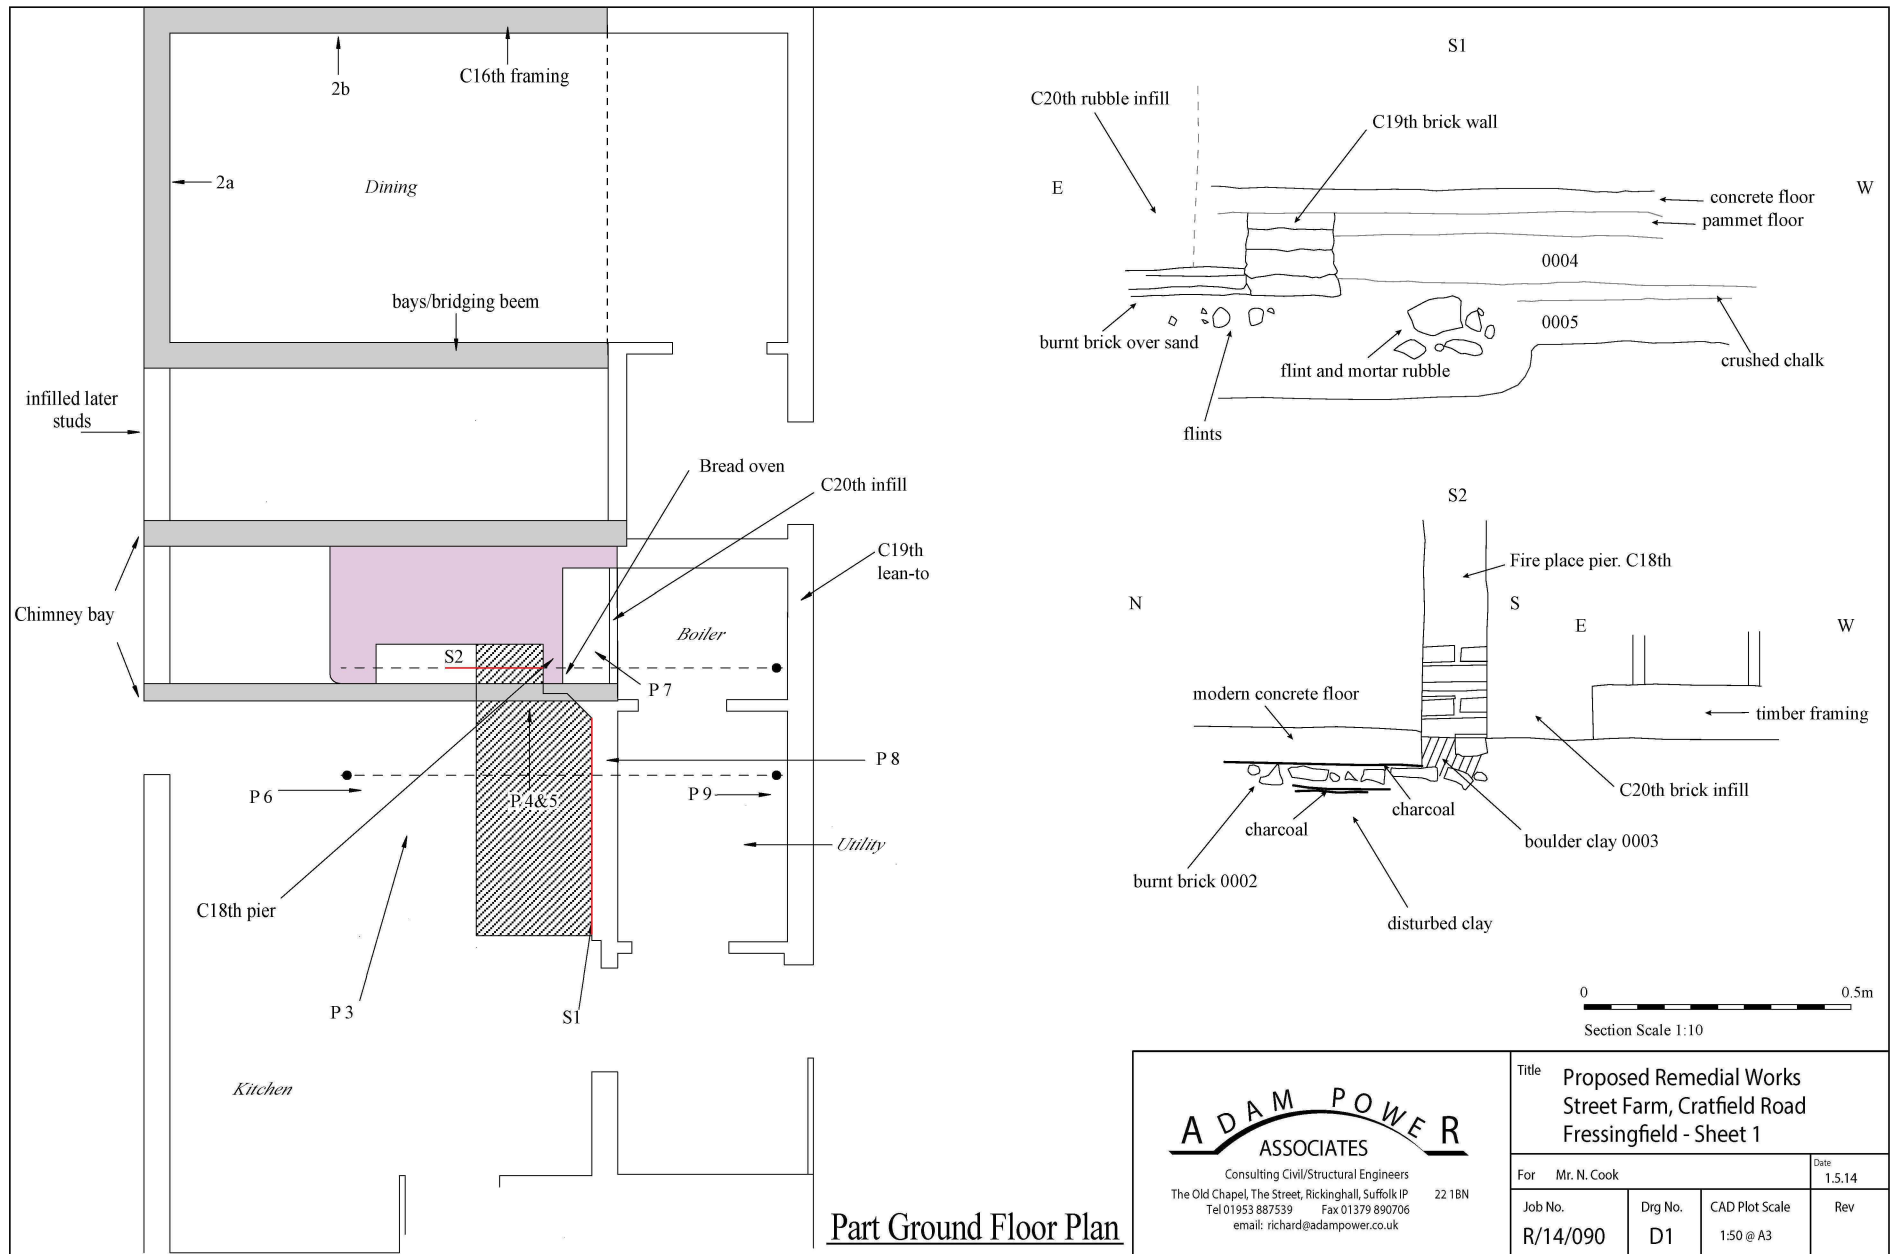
Ground plan of Street Farmhouse, adapted from the architect's drawing, showing viepoint of the photographs (P6 etc.) and recorded sections.
